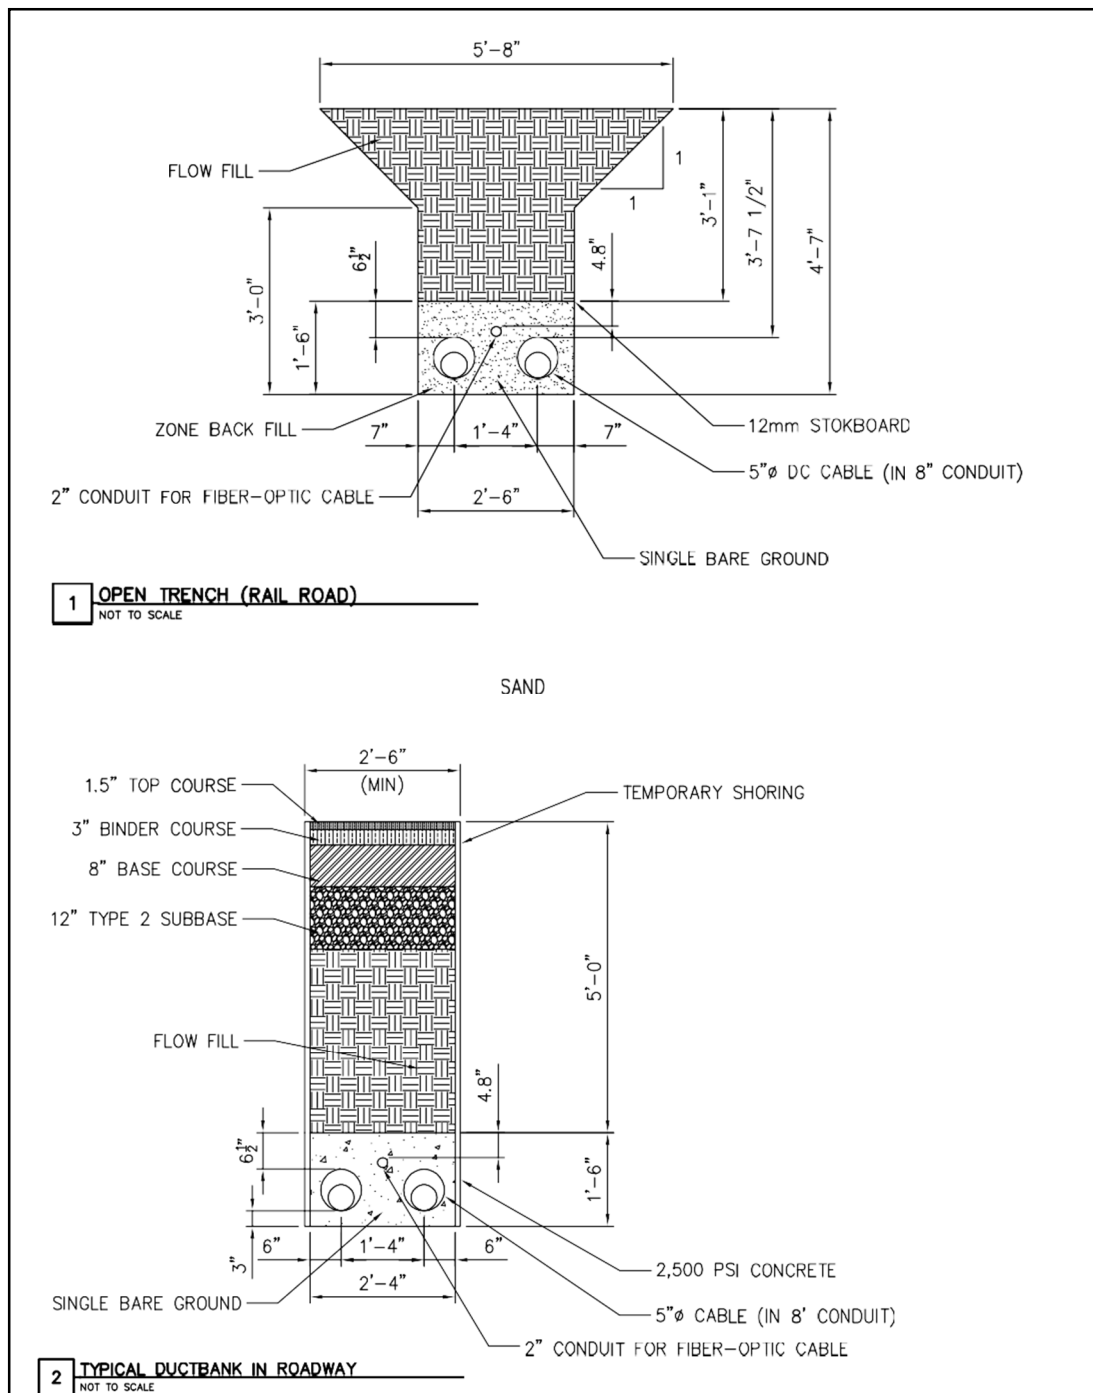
Typical open trench (railroad) and duct bank (roadway) installation of the cable illustrated.
